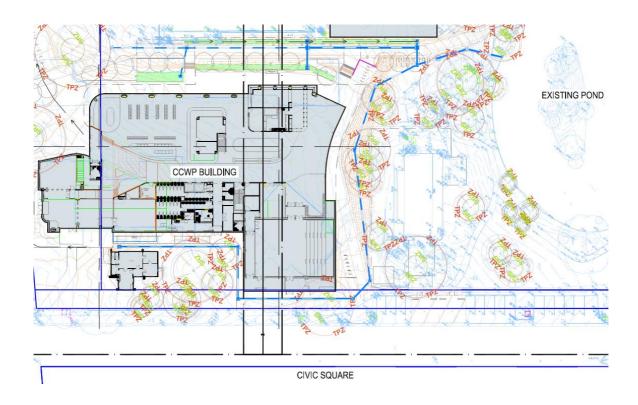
Extract from General Site Plan (Civil) with drainage indicated by blue lines.
